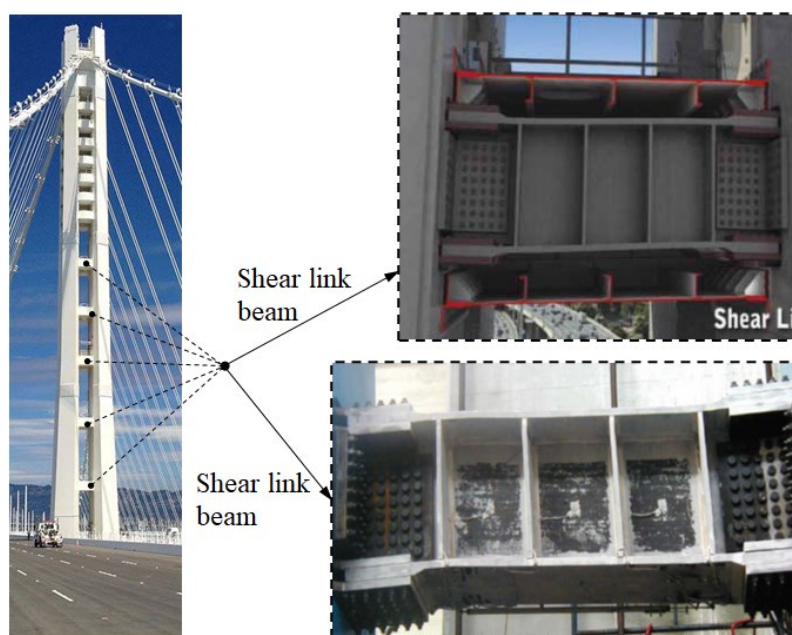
Tower shear link beams of the Oakland Bay Bridge [10] [9].
